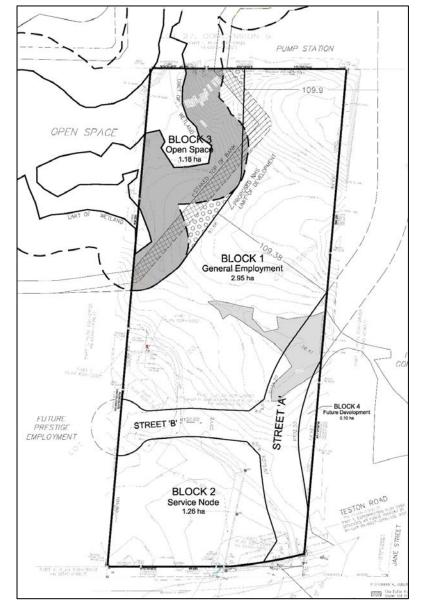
Draft Plan of Subdivision (Humphries Planning Group Inc.)
